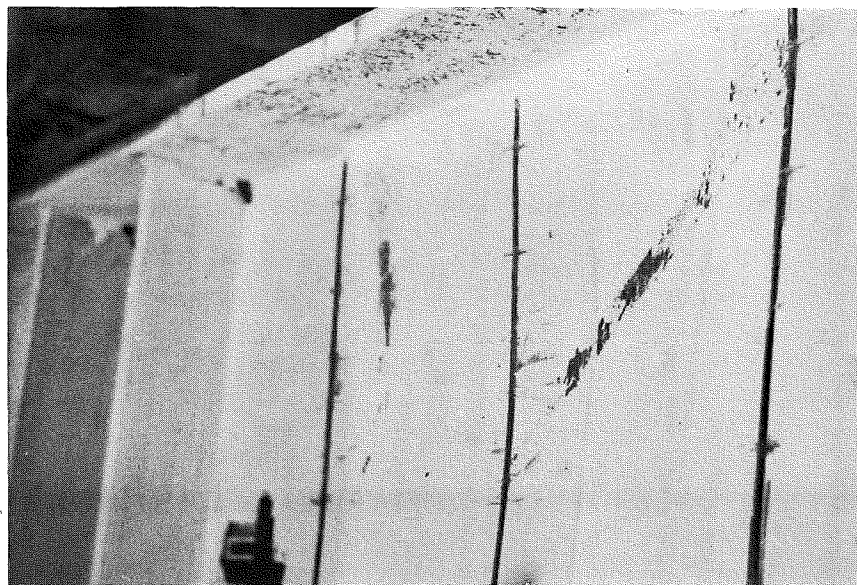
Flange Failure and Web Yielding (UG4.4)
